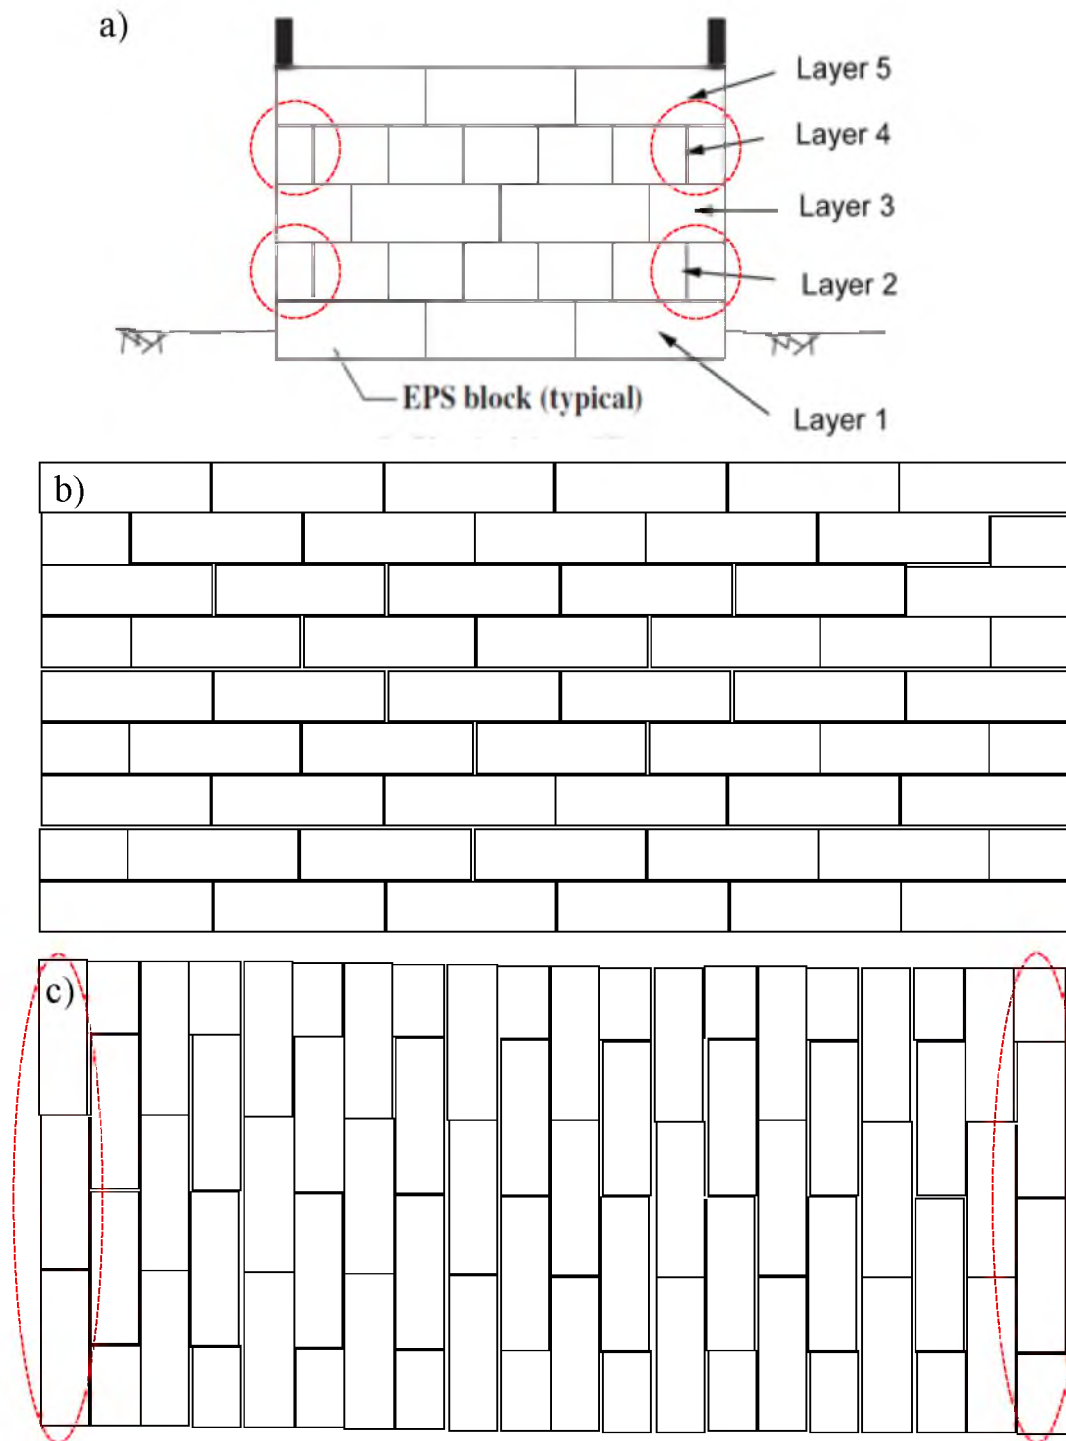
EPS geofoam embankment's a) Cross section (modified after Stark et al., 2004), b) Plan view of layer 1 and c) Plan view of layer 2
